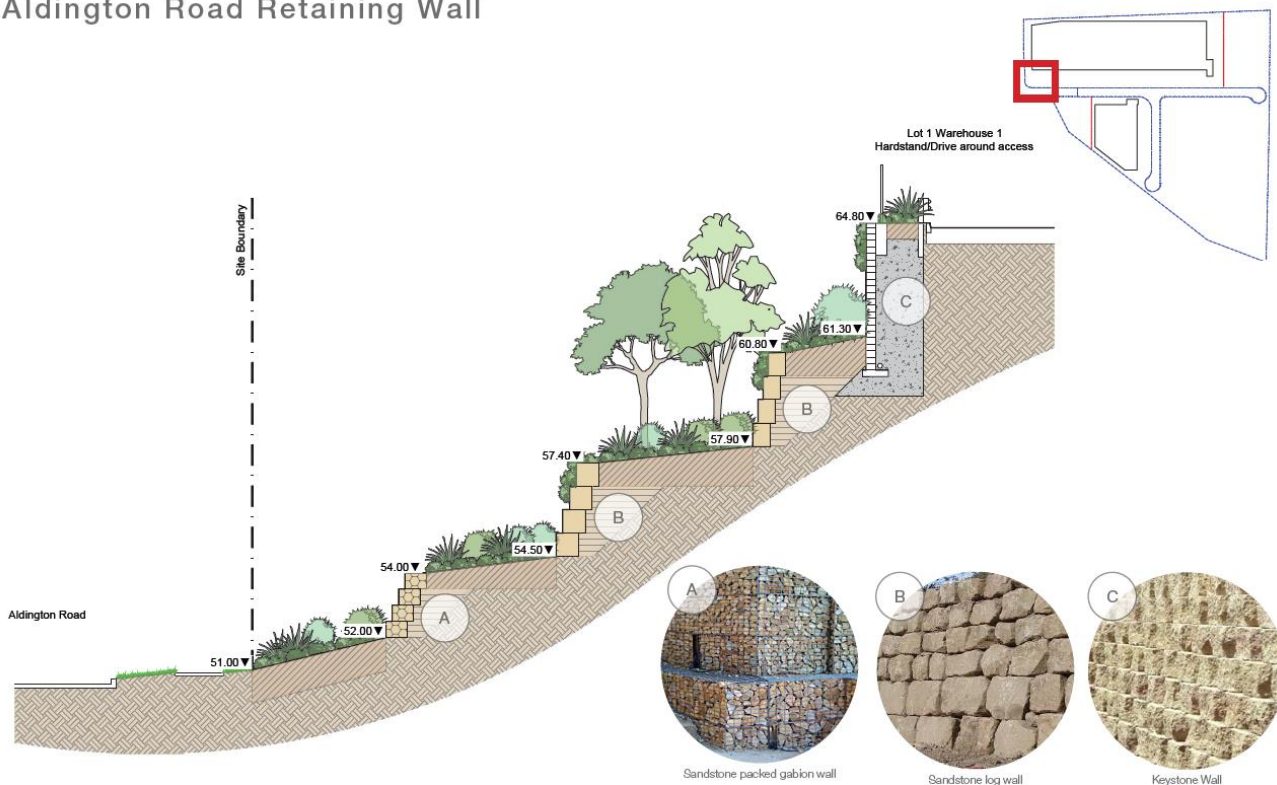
Proposed landscaping treatment of retaining wall adjacent to Aldington Road
